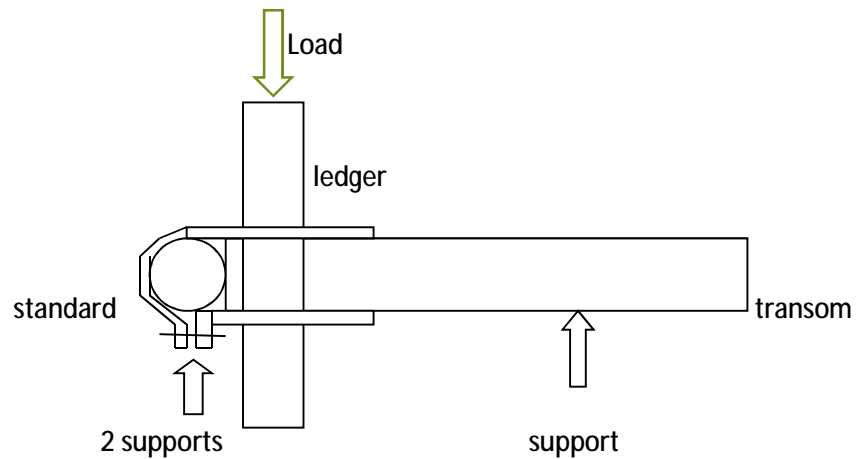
Diagram of load test type 2 (elevation in Y direction)
